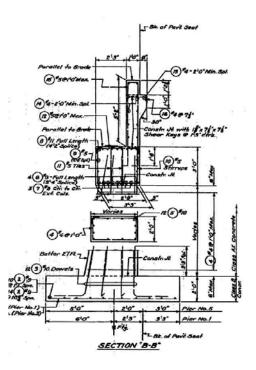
Bridge 512/19 Abutment Cross-section
